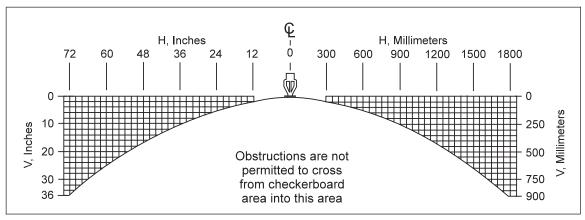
Obstruction Area to Umbrella Pattern of Ceiling-Level Storage Sprinklers on Standard Spacing
